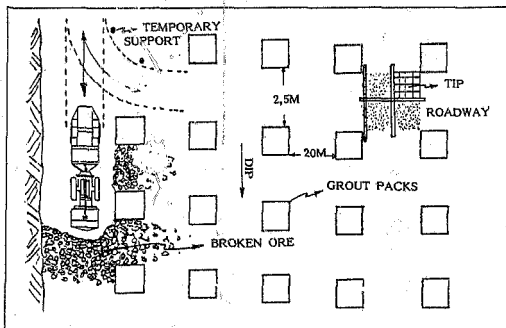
A plan of an L.H.D. unit loading down dip.
